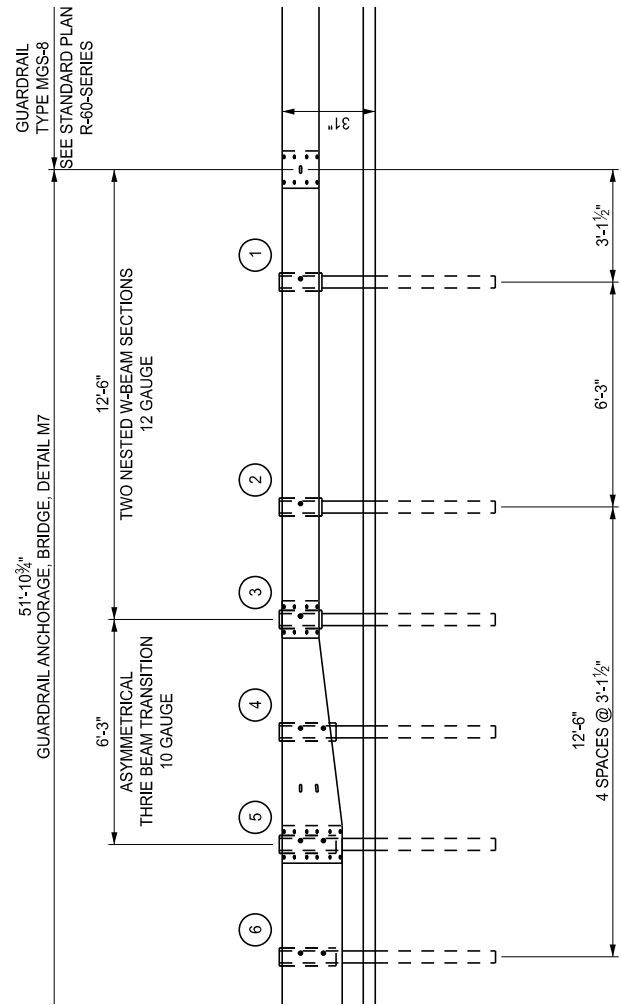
DETAILS FOR CONNECTING GUARDRAIL TYPE B TO
